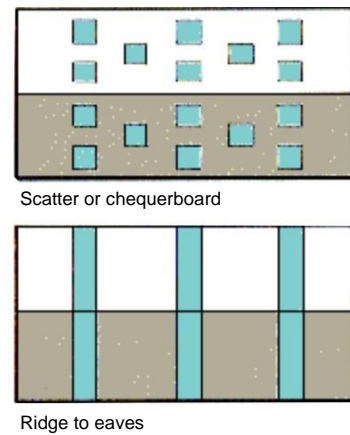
TYPICAL ROOFLIGHT PATTERNS
